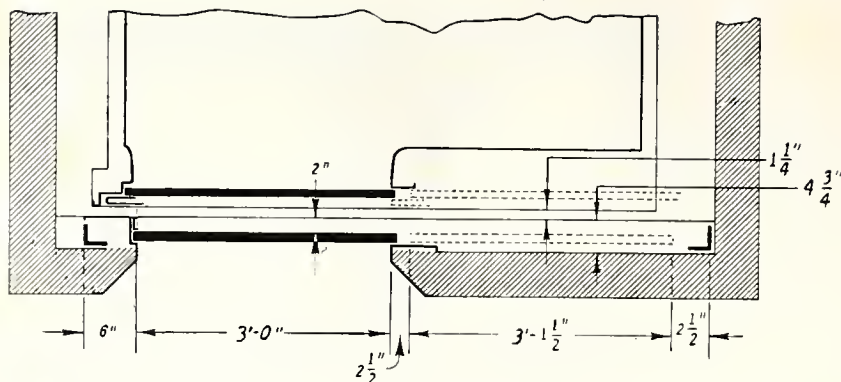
A layout illustrating single slide car and hoistway doors. This arrangement is widely used for clear door openings up to 3'-0".
